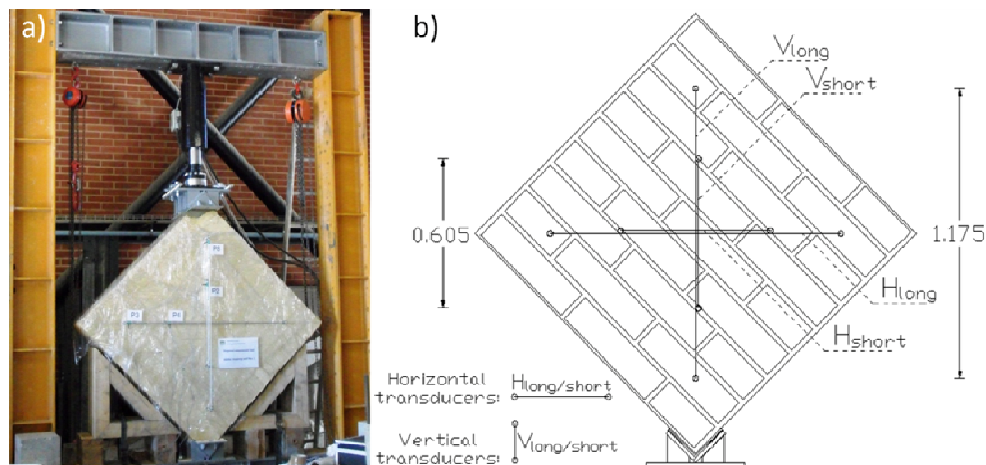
Diagonal compression test set-up and instrumentation layout.
